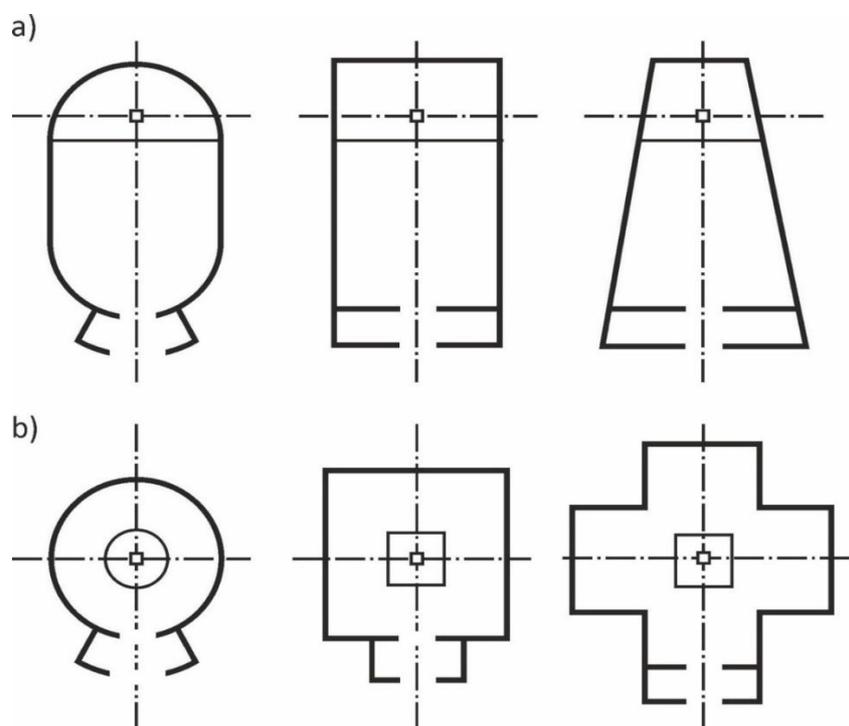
/a,b. Theoretical sacred space layouts, longitudinal and central a). Longitudinal layouts of sacred space based on the plan of the synthesis of two circles, rectangular plan and trapezium plan. b). Central layouts of sacred space based on the plan of circle, square and Greek cross. Drawings by Author.
